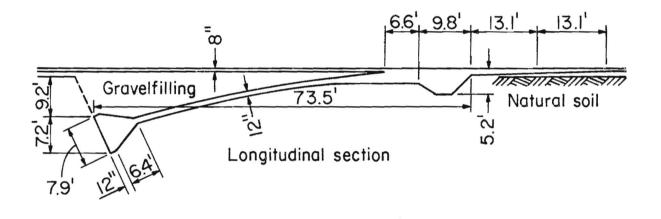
ABUTMENT FOR PRESTRESSED ROAD AT SALZBURG, AUSTRIA
